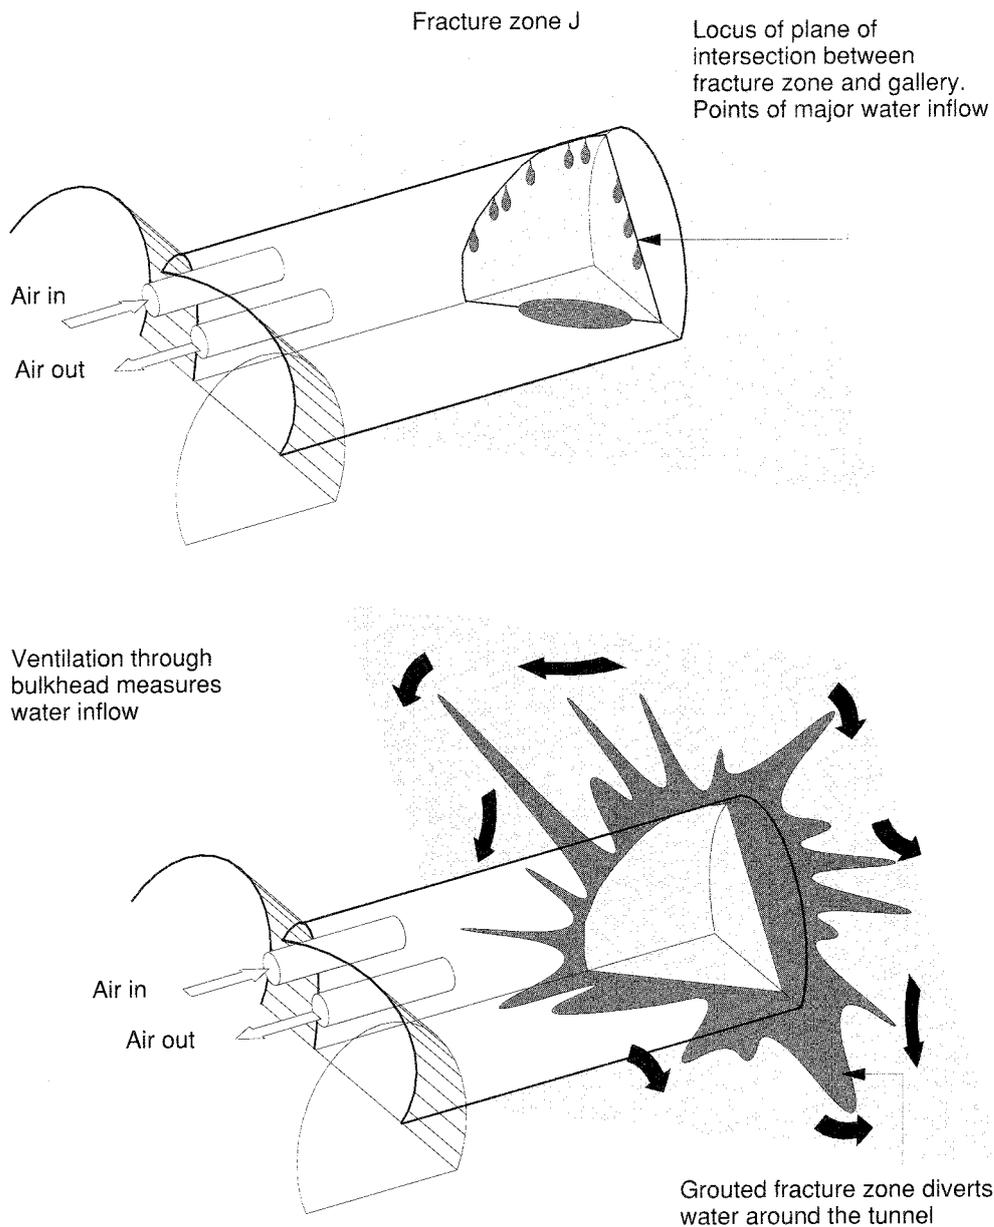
Concept for testing the efficacy of grouting a zone of moderately fractured, water-bearing rock.
